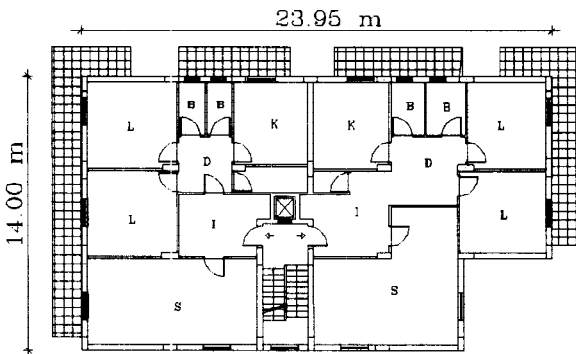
Plan of the building under examination with its main geometrical dimensions
